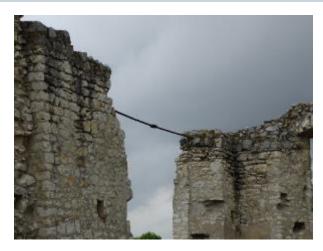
Tie beam connecting walls in the northern part of the premises - changing the static scheme
